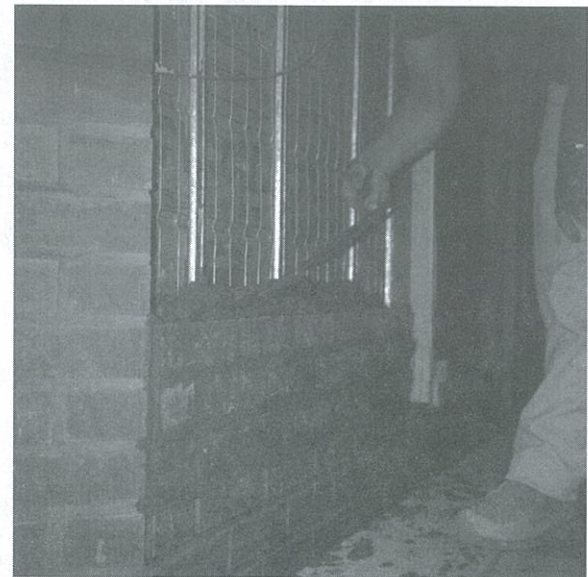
"Steeltex" or "K-Lath" on wood studs, being slush grouted.
